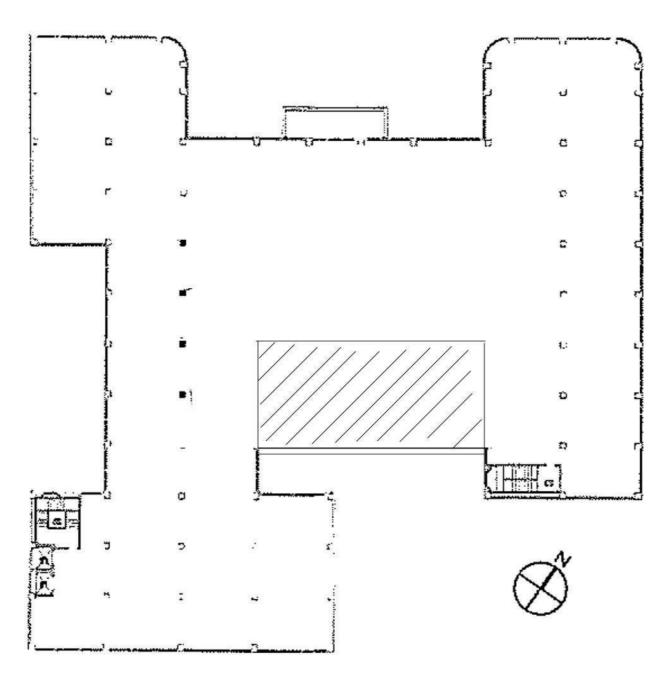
Plan 15 - 21 Stout St with demolition for unwanted columns and additional wall specification to accommodate new design proposal.
